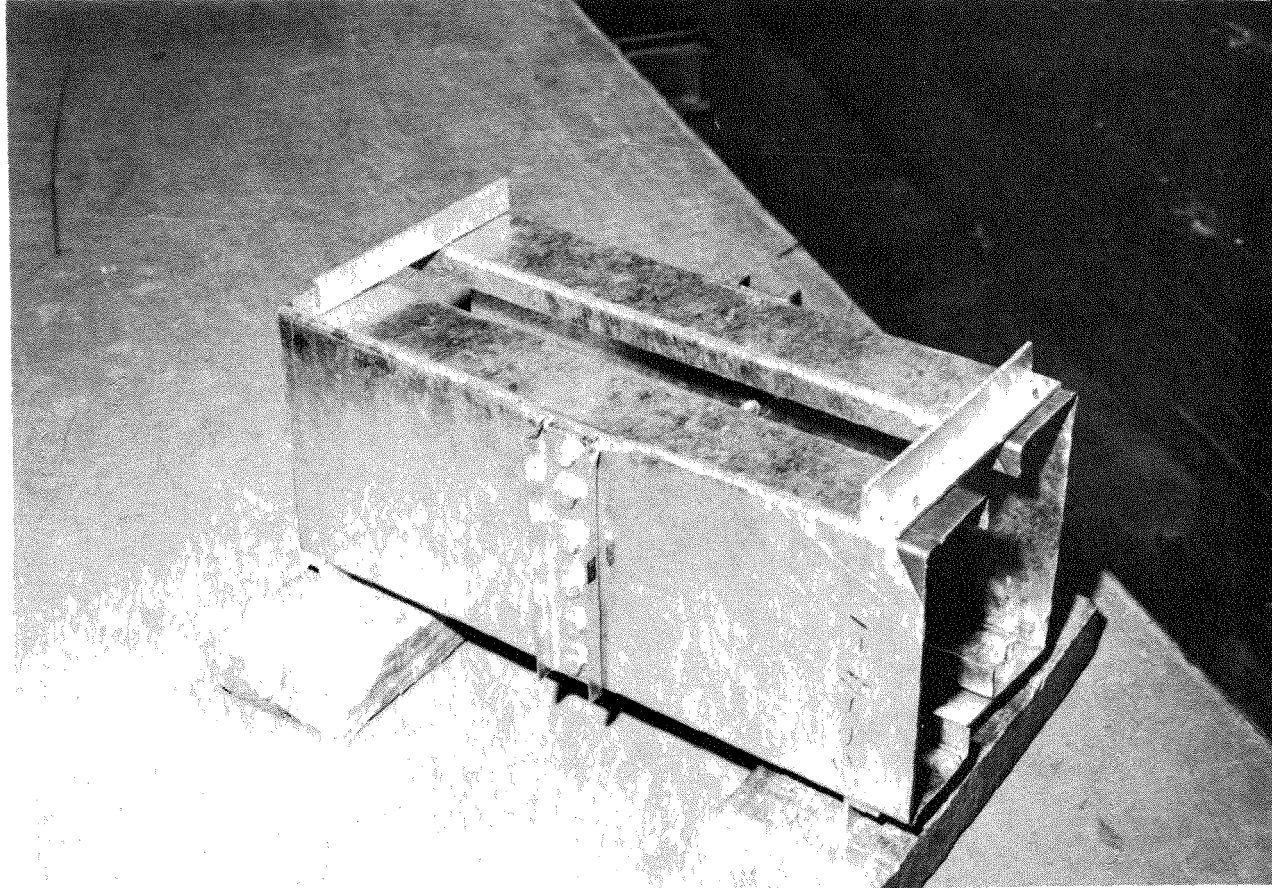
Photograph of End Crushing Failure Mode for Intermediate Stiffener Tests
